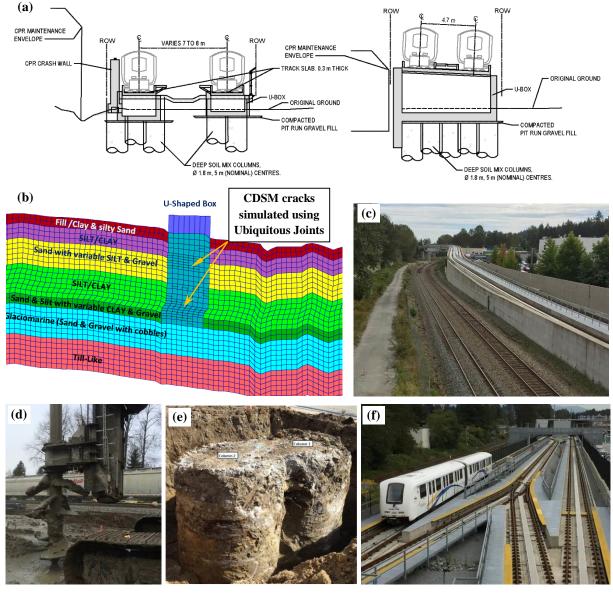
a) Details of CDSM ground improvement, tracks, crash wall and a U-shaped approach structure; b) FLAC model deformed shape, c) transition from at-grade to elevated guideway, d) soil mixing auger, e) exposed hardened CDSM columns; and, f) cross-over at-grade section approaching Moody Centre Station.
